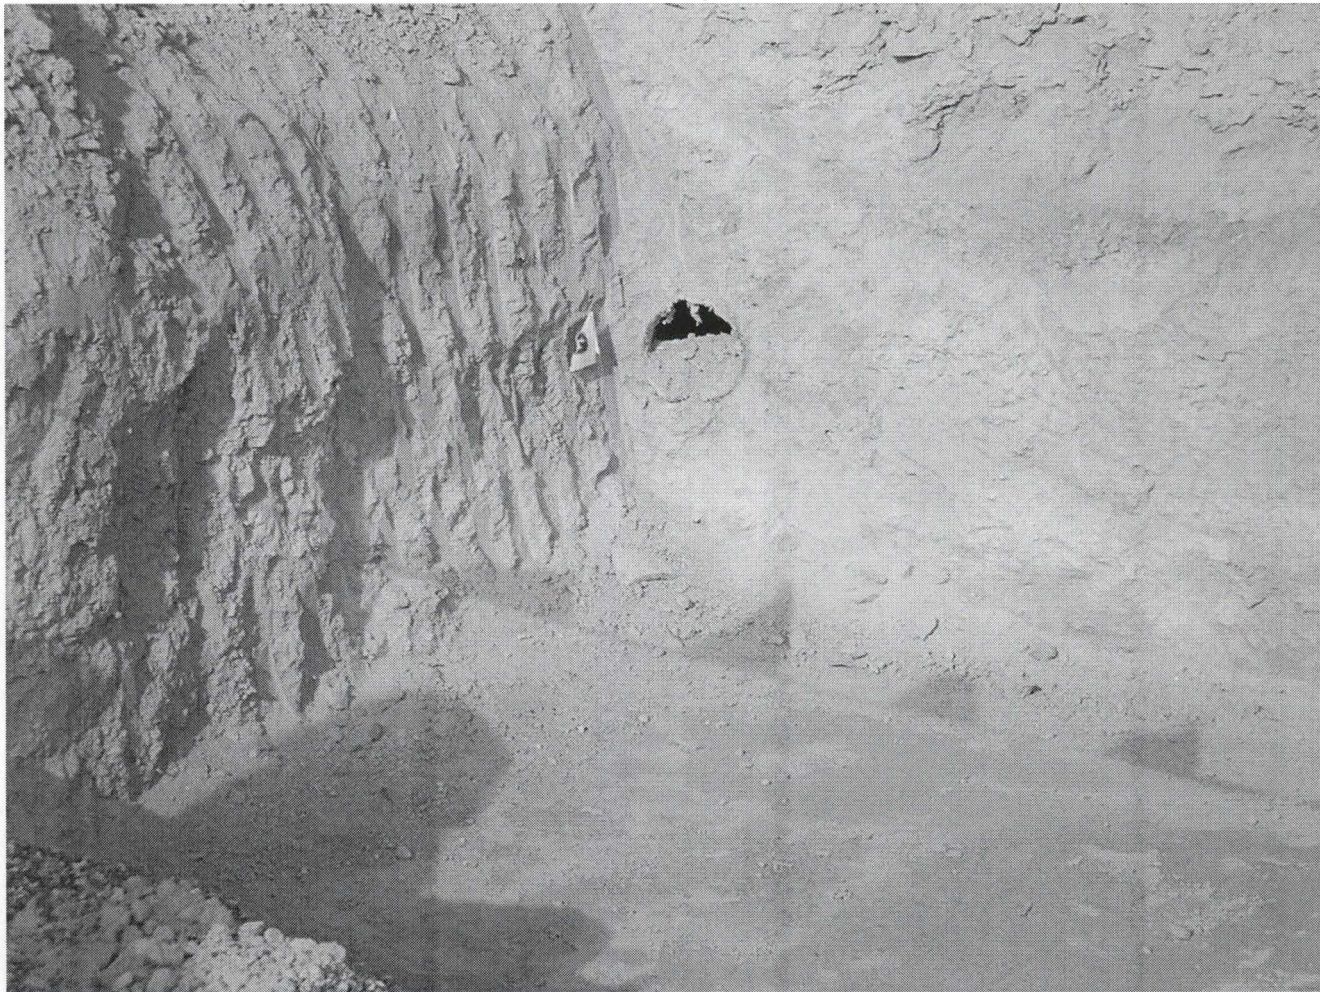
Probable transite pipe (see Photo 8) extending out of side wall of excavation – note pipe fragment below pipe
